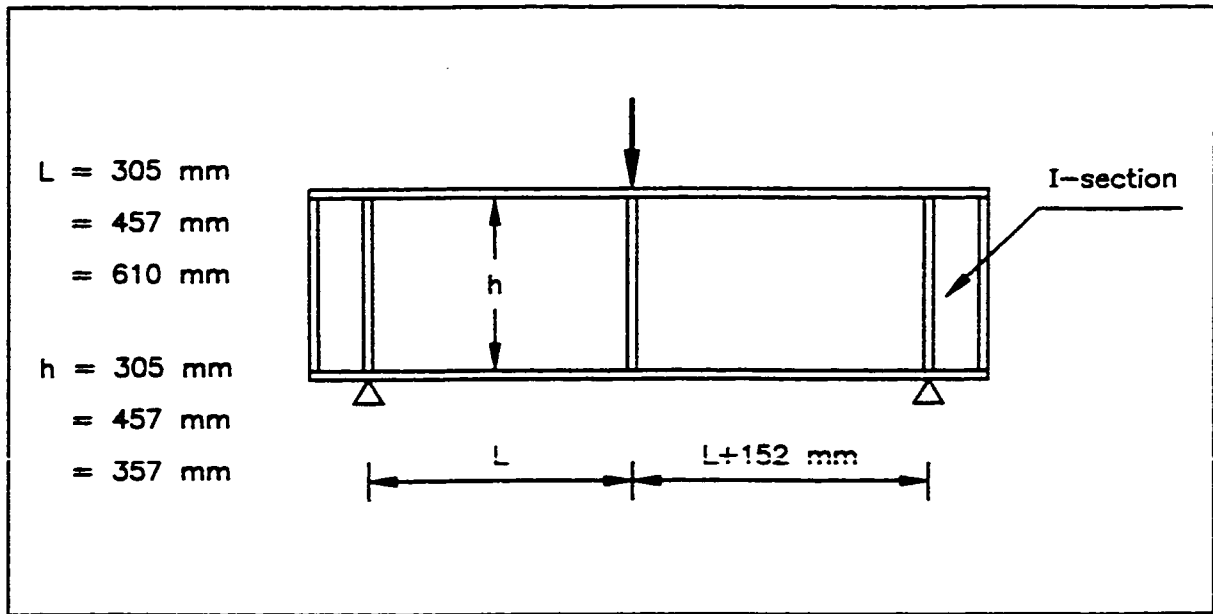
Geometry of test specimen for shear tests, [ref. 12]
